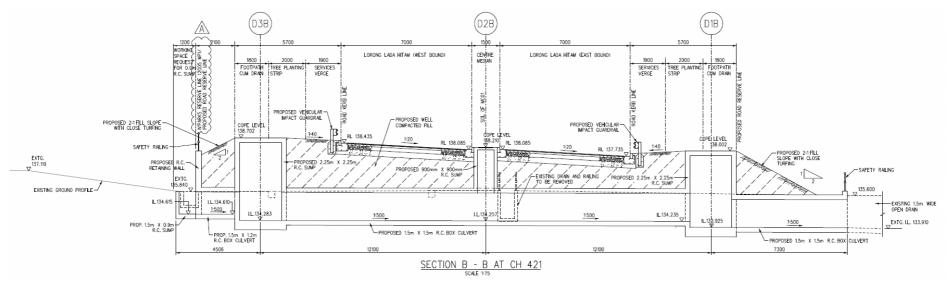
Proposed Construction cross-section for CH 421 (Source: BCA, 2022)
